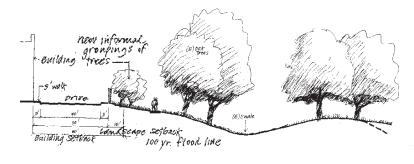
Conceptual Stock Ranch Road Section (Commercial)
